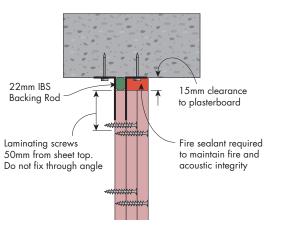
Laminated Duct Deflection Head to Slab Elevation
